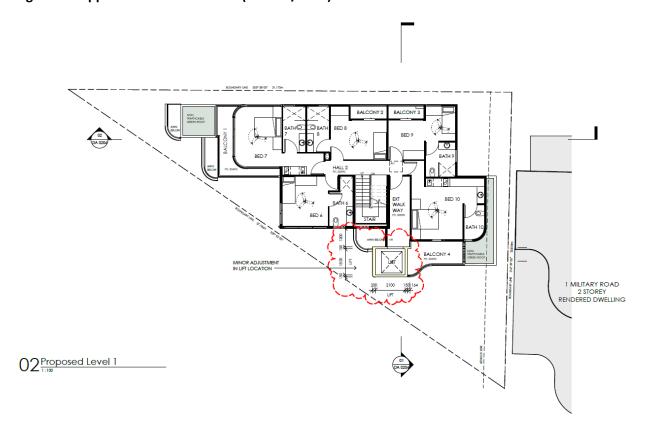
Proposed First Floor Level (DA-203/2021/A)
